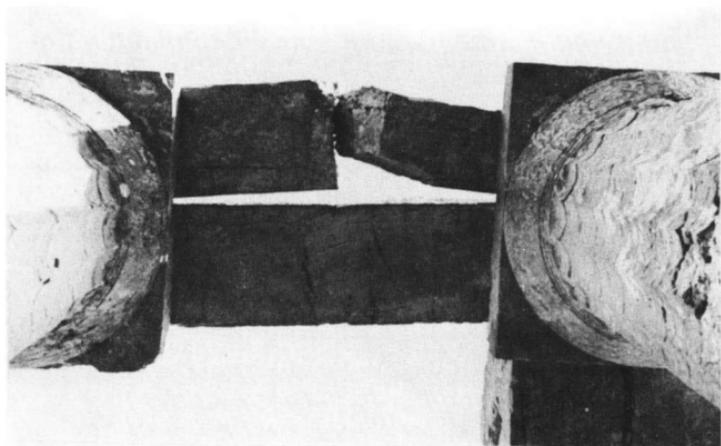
Leaning columns and damaged lintel of the temple of Apollo at Bassai after the earthquake of March 1965.
